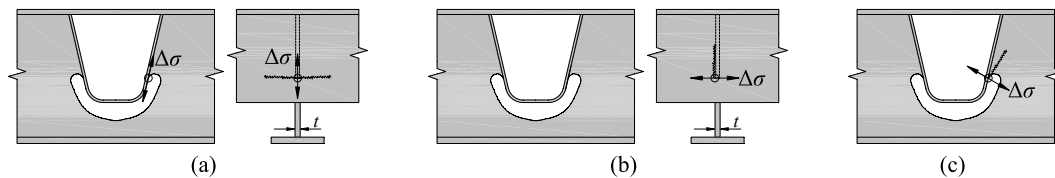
Fatigue crack at rib-to-crossbeam welded joint: (a) longitudinal crack on U-rib; (b) vertical crack on U-rib; (c) crack on crossbeam.
